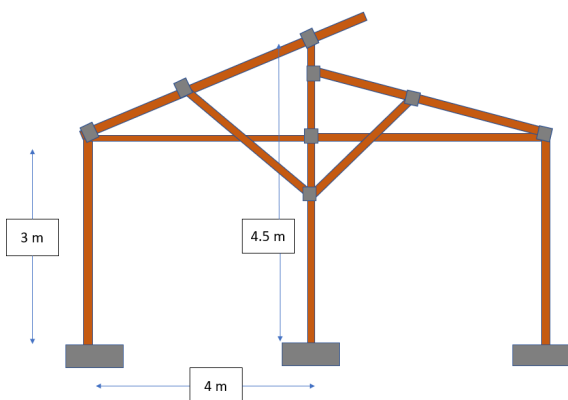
(a): Sectional view of existing bamboo polyhouse structure
